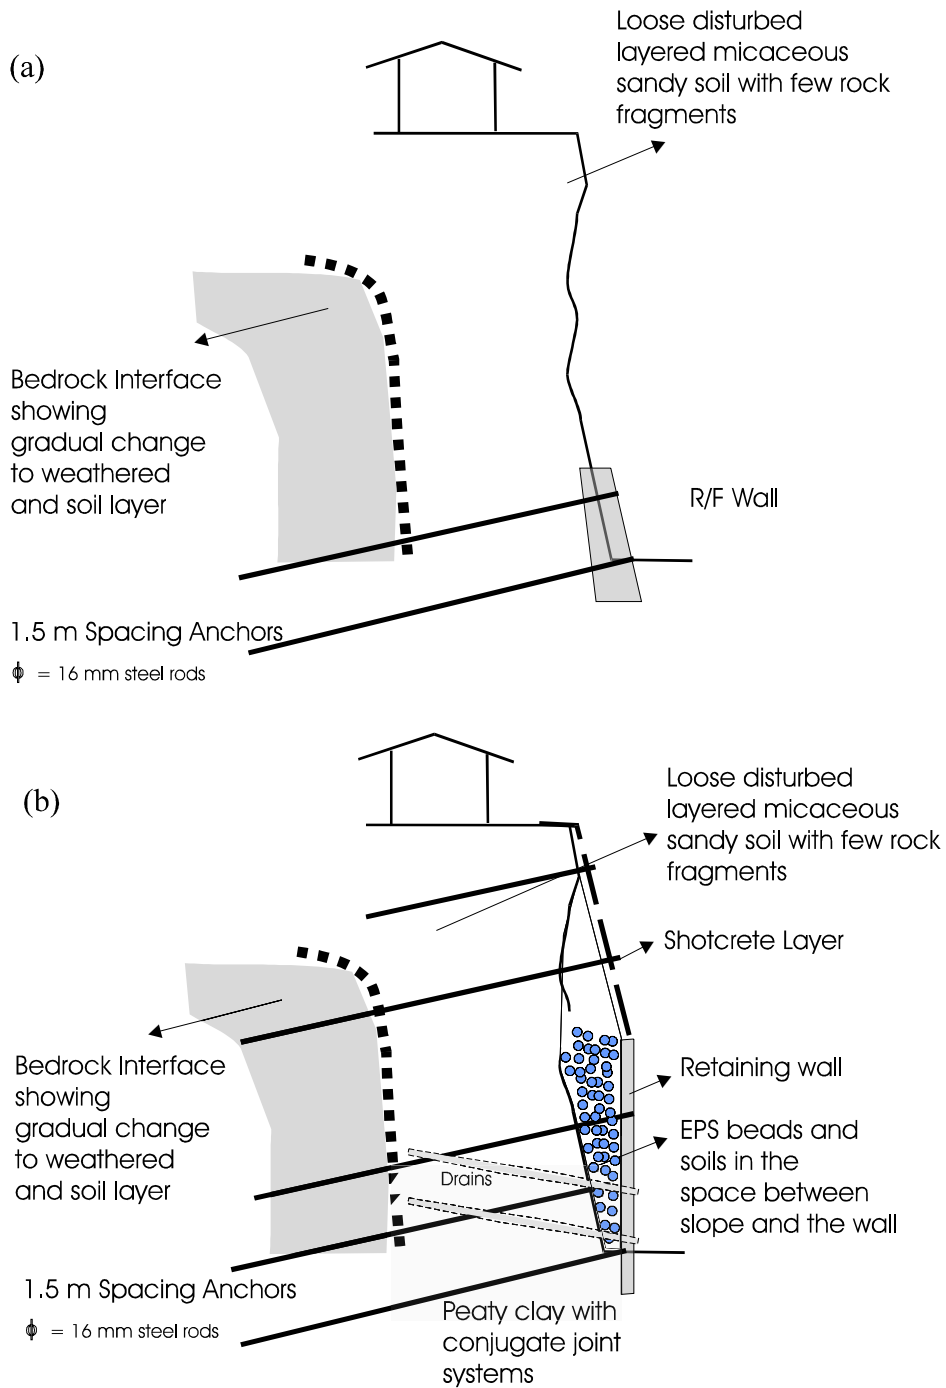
Details of the retaining structure as shown in the figure 2. (a). Original proposal based on simple reinforced wall and anchors, (b). Earth pressure reduction by filling EPS beads and soil in the space between slope and the retaining structure.
